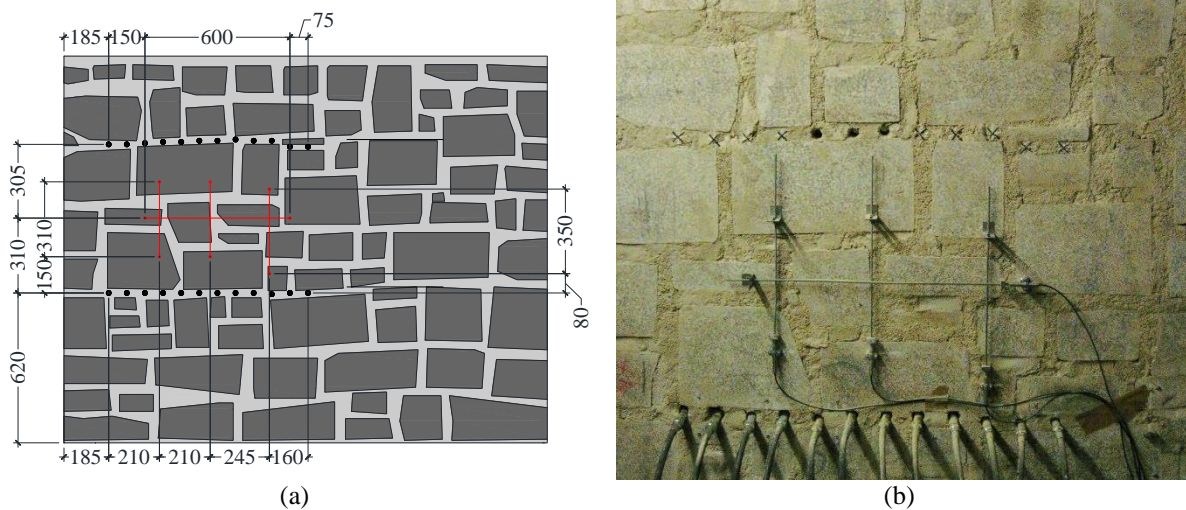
LVDT arrangement for the double tube-jack test on the semi-irregular wall: (a) locations and dimensions [mm]; and (b) photo of LVDTs attached to the wall
